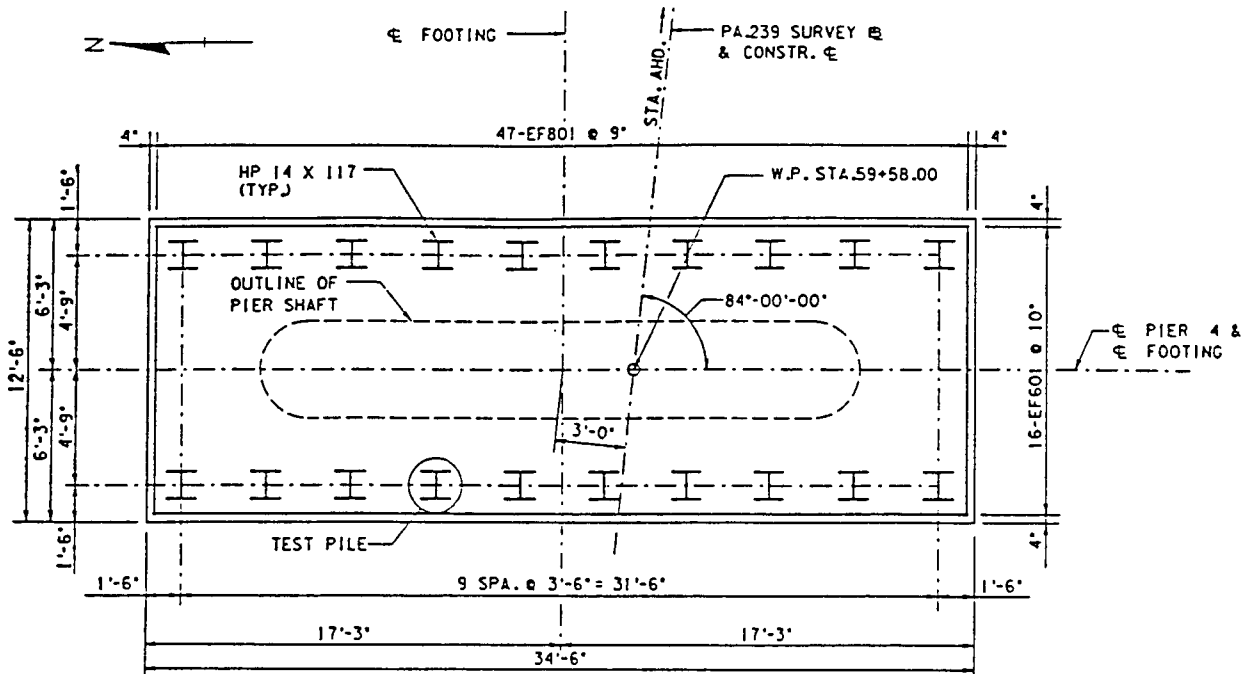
Louisiana Pile Supported Footing Details
